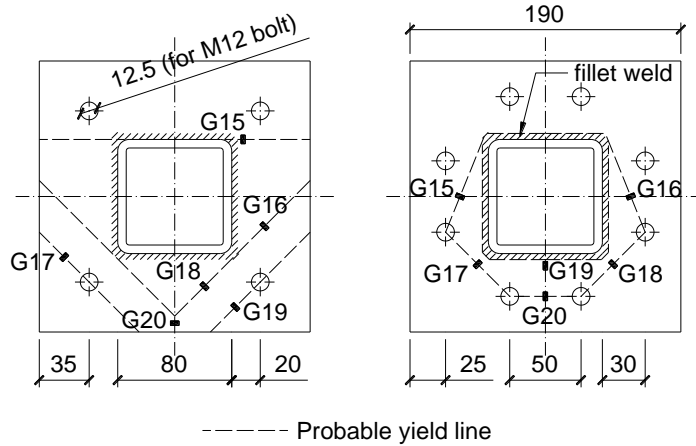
Dimensions of steel flange-plates with four (B-170-4) and eight (B-120-8 and B-170-8) bolts and the positions of the strain gauges (all dimensions in mm).
